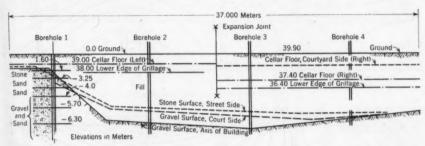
Soil Condition at Site of a Brick Building, in Vienna, Austria
